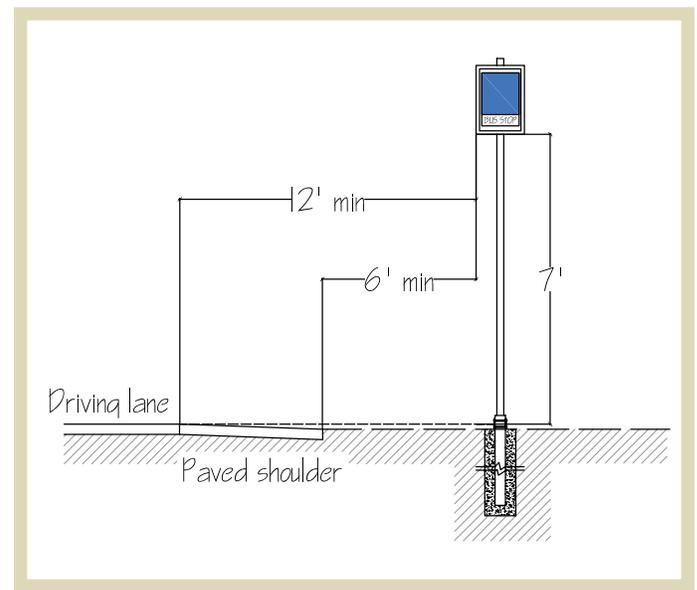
| Dimensions for a bus stop sign placed adjacent to the travel lane of a road without curb and gutter.
